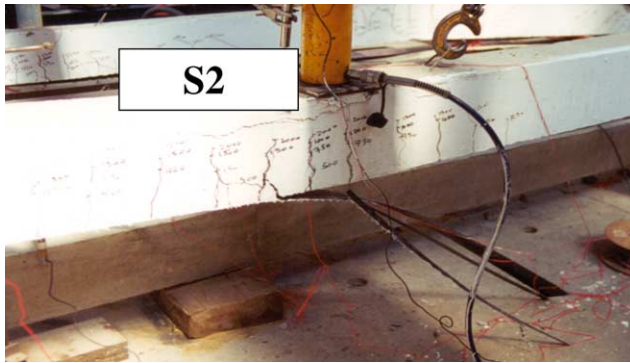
CFRP sheet separation without concrete cover (beam S2).
